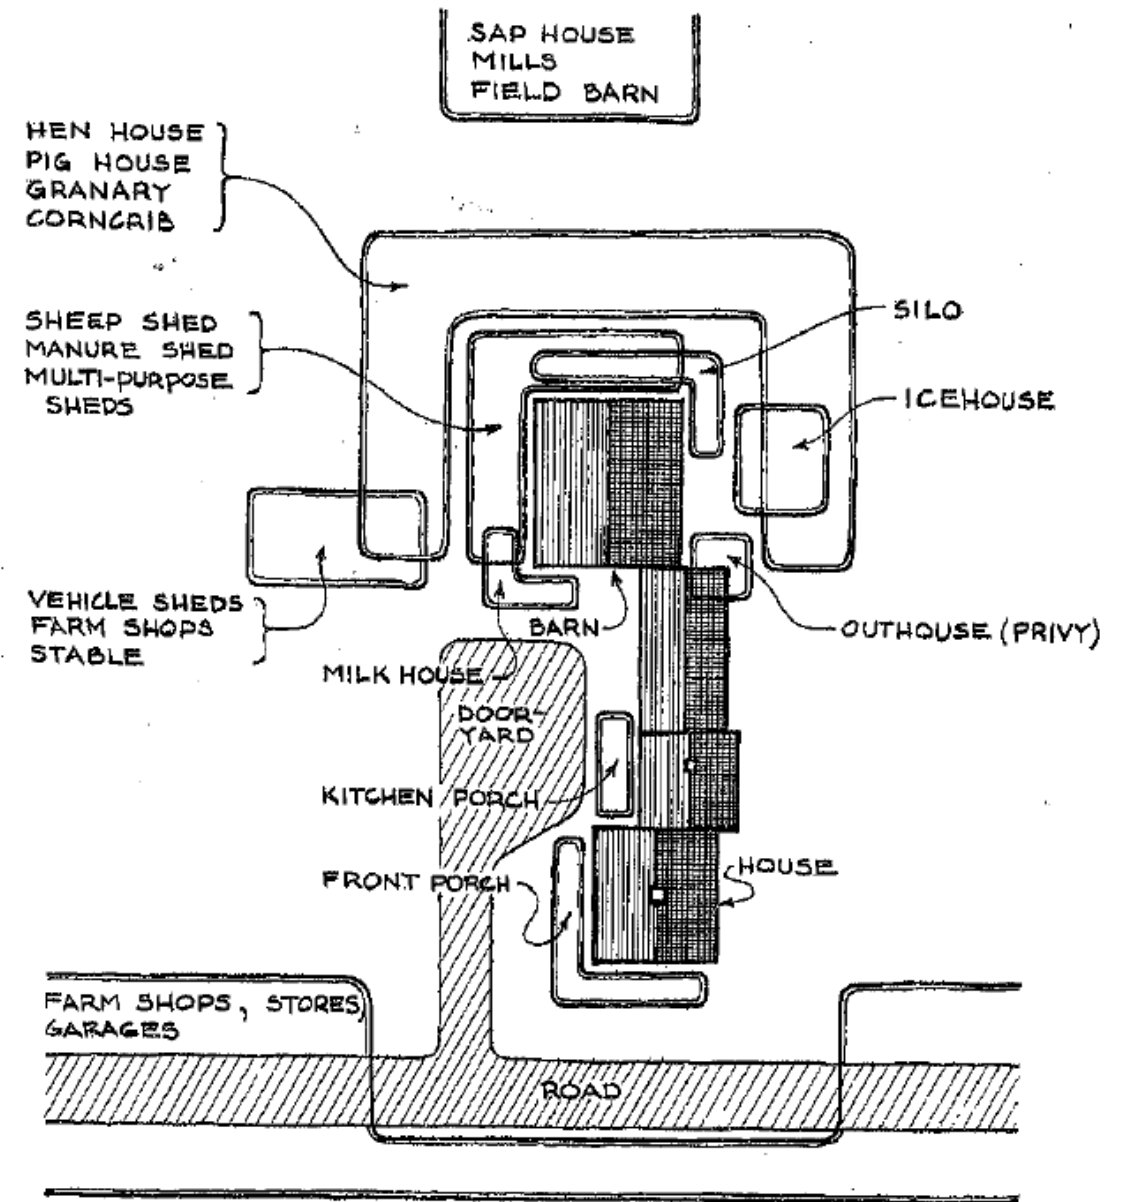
The pattern of outbuilding location. Zones indicate the typical location for outbuildings and connected sheds surrounding the connected farmstead.
